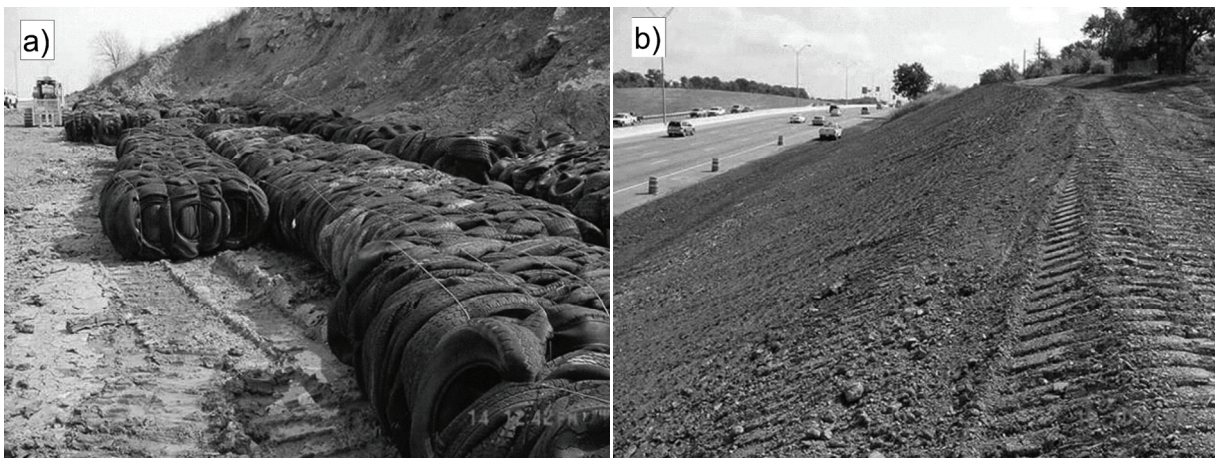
Embankment slope repair at I-30 highway in Fort Worth, USA: a) tyre bales placed at the toe of the slope; b) tyre bales covered with soil and shaped to match the surrounding slope [16]
